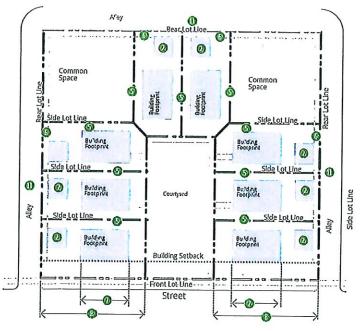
F. House D Court: Multiple Principal House D Buildings
